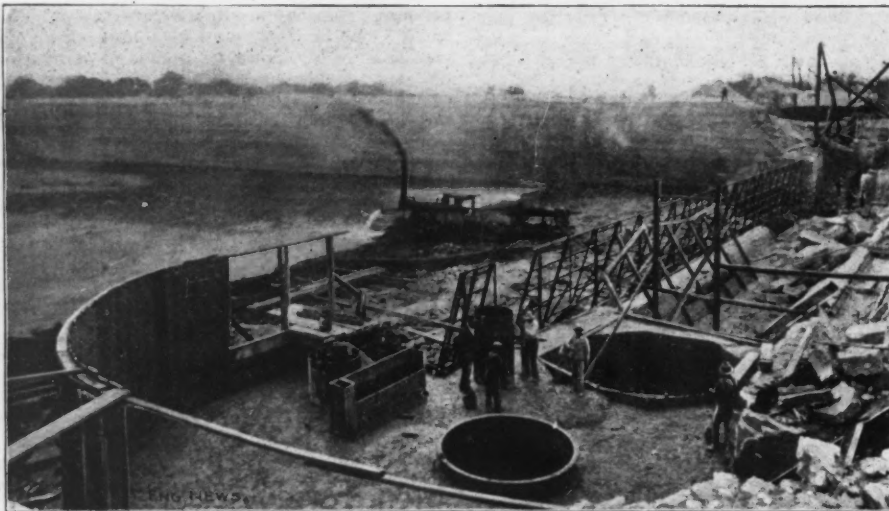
VIEW OF BEAR TRAP DAM FOUNDATIONS UNDER CONSTRUCTION.
